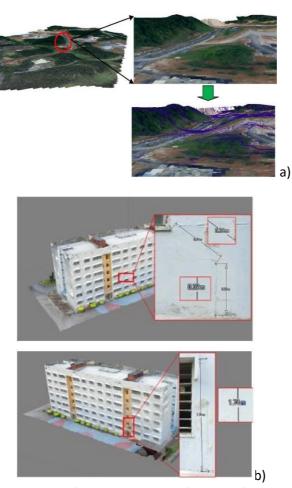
Drone Application; a) Slope Mapping, b) Building's Crack Measurement
